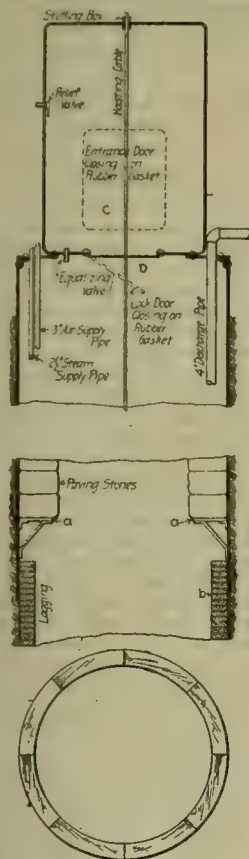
STEEL CAISSON AND SEGMENTAL LAGGING USED IN SINKING SHAFT OF MALDEN SIPHON TUNNEL, AT BOSTON, MASS.
